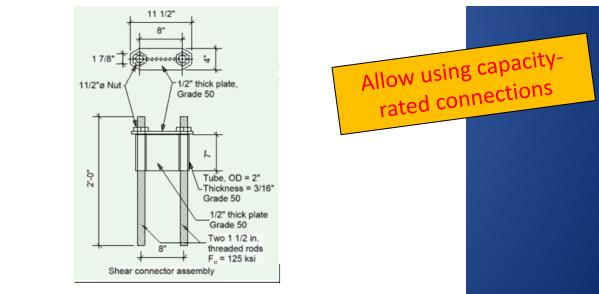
Special connection system developed by Badie et al. (2018)
